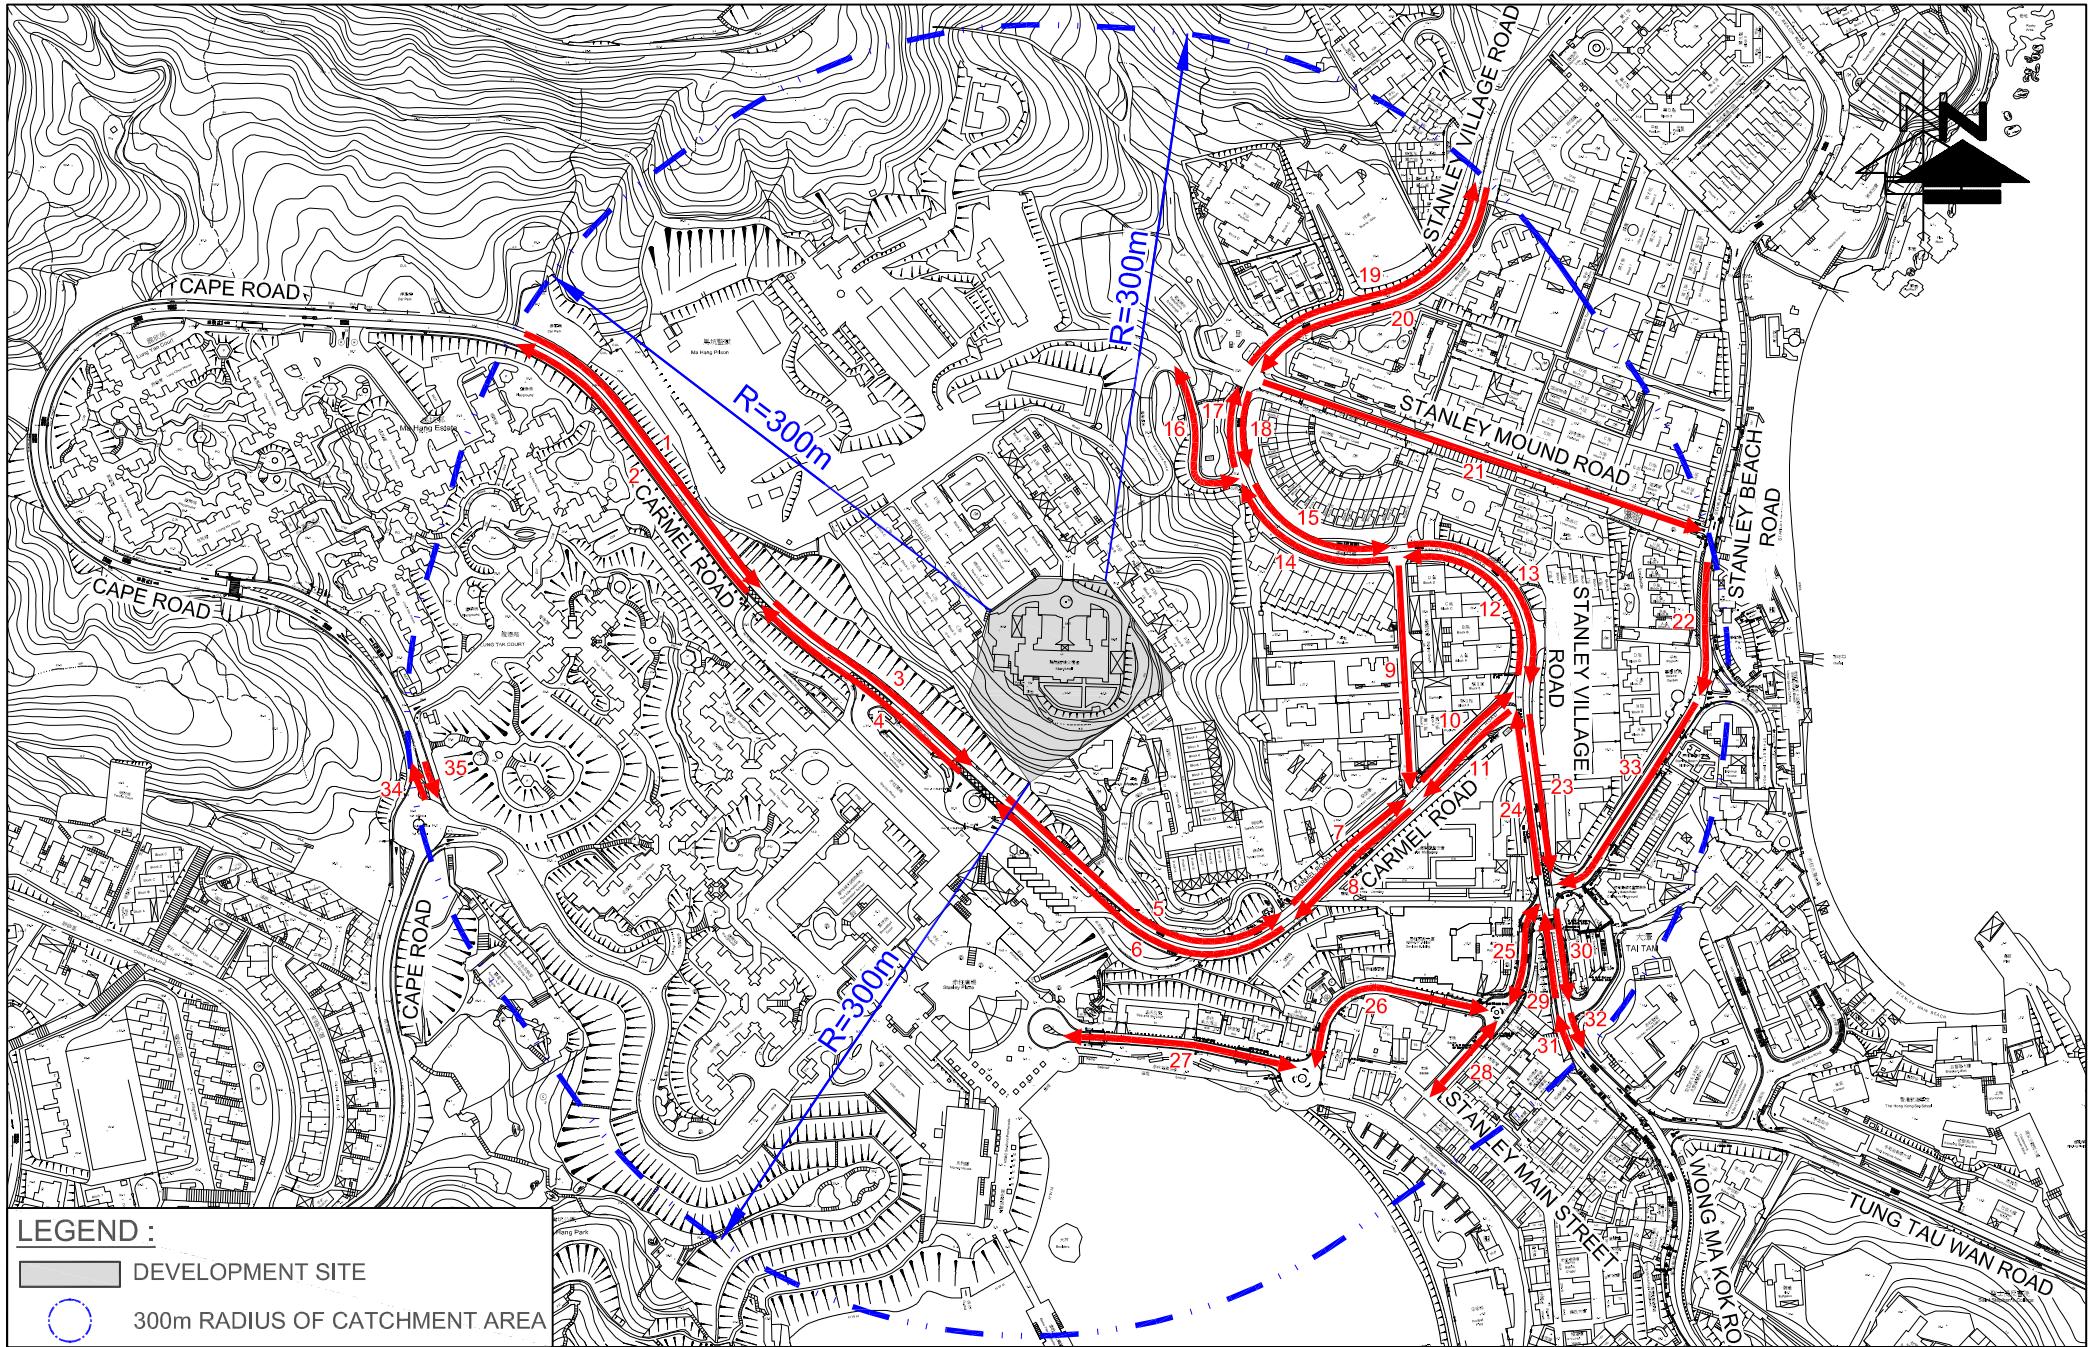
PROJECT TITLE: Section 16 Planning Application for Minor Relaxation of Plot Ratio, Building Height & Site Coverage Restrictions for Proposed Residential Development at 44 Stanley Village Road, Hong Kong
